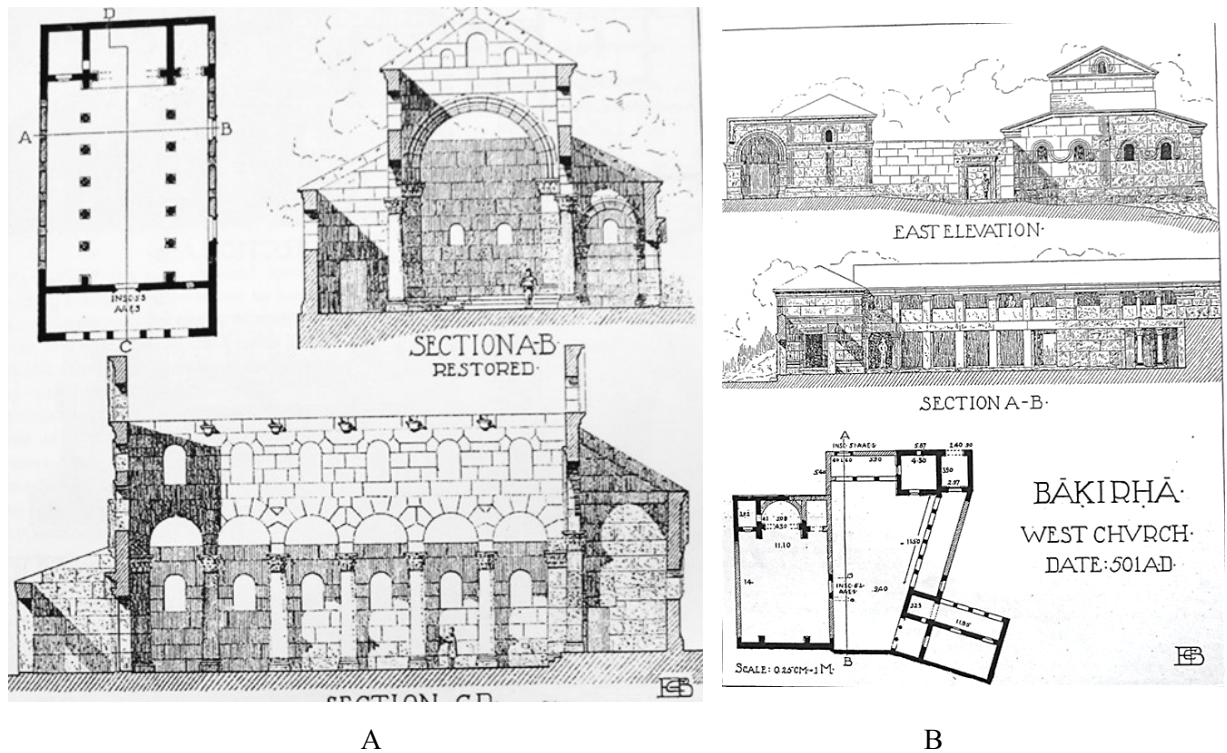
A. East Church plan and section. A view facing west, (Butler, 1929, pp. 138-140). West Church plan of Bāqirhā, section and façade (Baqirha), (Butler, 1929, p. 133)
